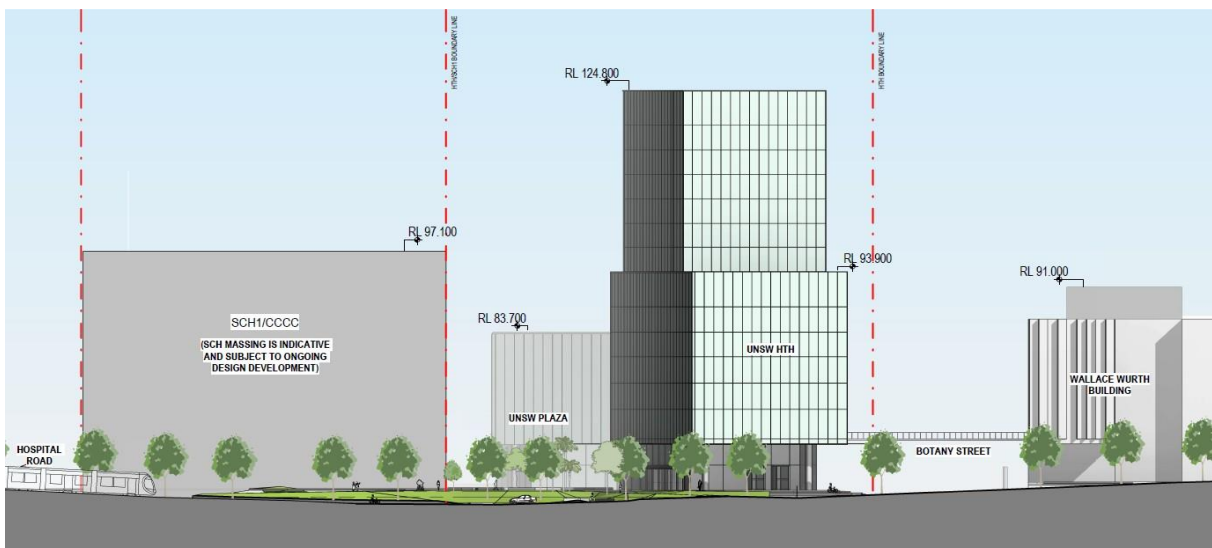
Proposed HTH, north elevation (Source: Architectus)
